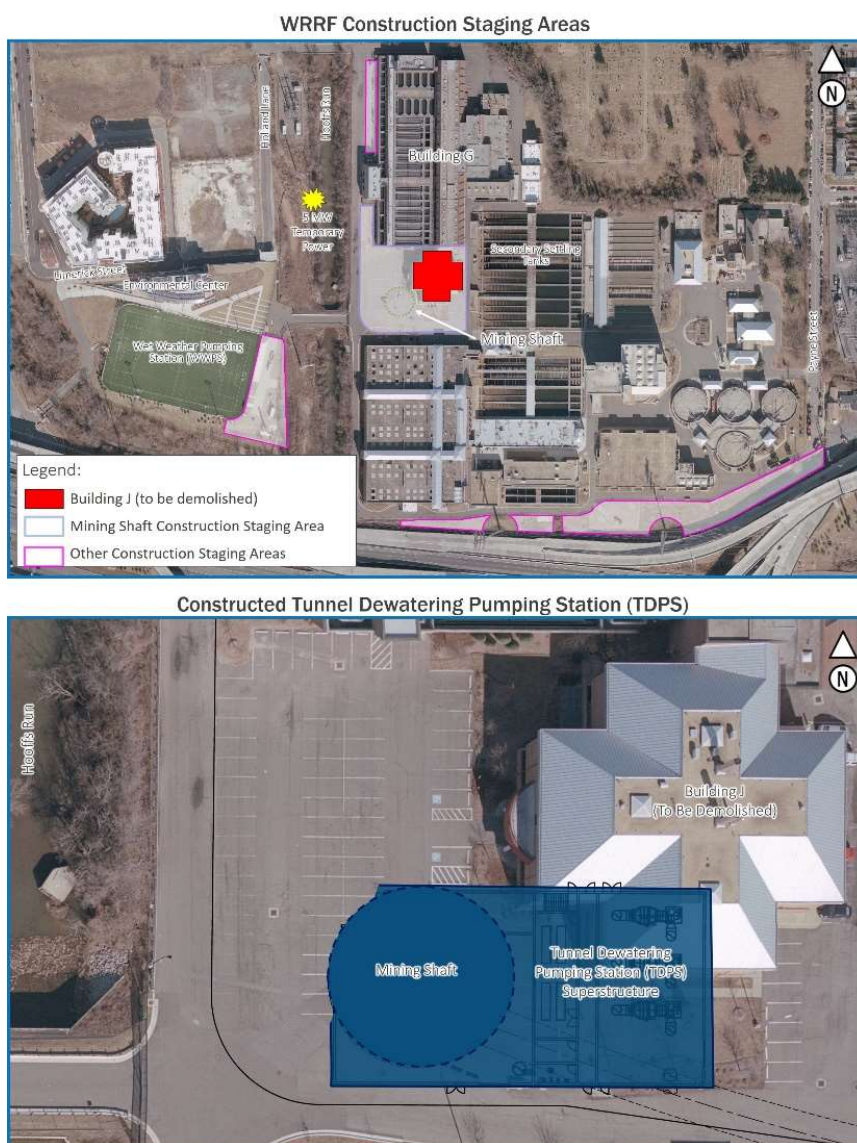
Tunnel Dewatering Pumping Station and Construction Staging Areas
